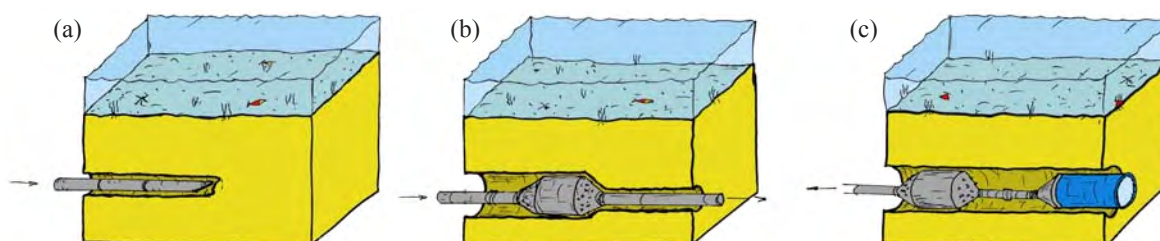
Pilot drilling (a); enlargement with pushing-reamer (b); pipeline-installation (c).
